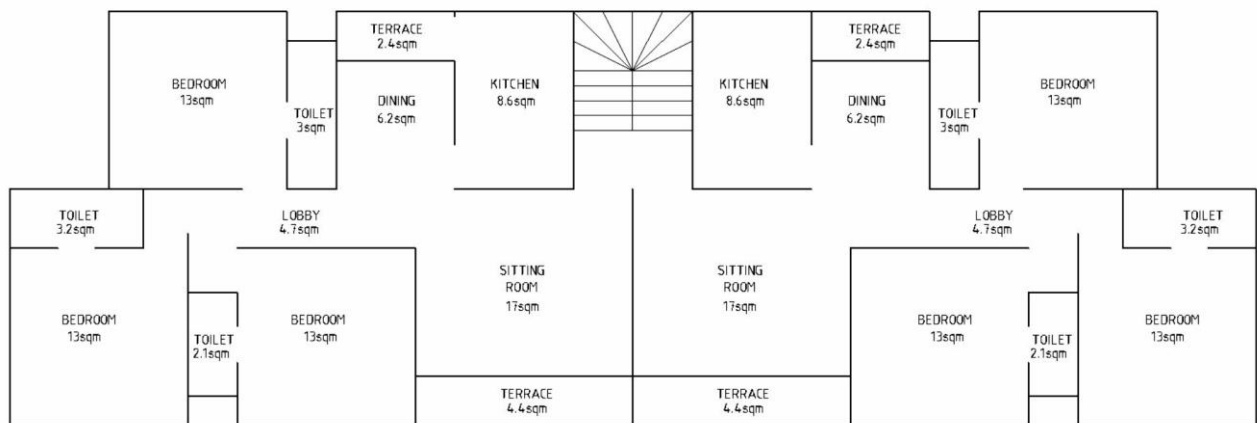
Sketch of a typical Floor Plan of a twin 3-bedroom flat in the low density area of Ikeja
